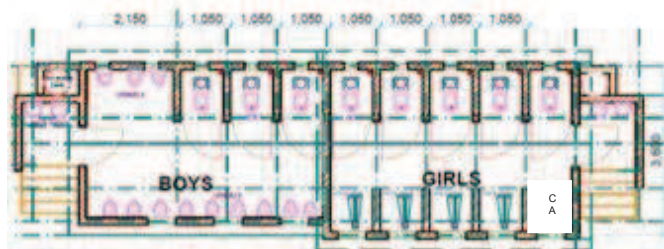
Floor plan for the toilet block at Crater View School (Source Muchiri, 2009)
